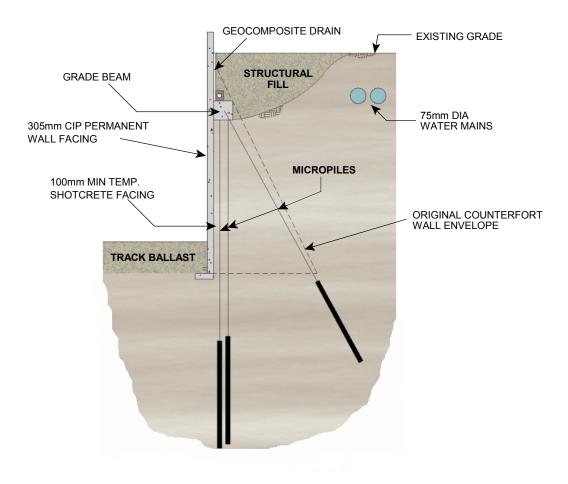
7. Wall 600 Permanent Earth Retention, Portland, Oregon
